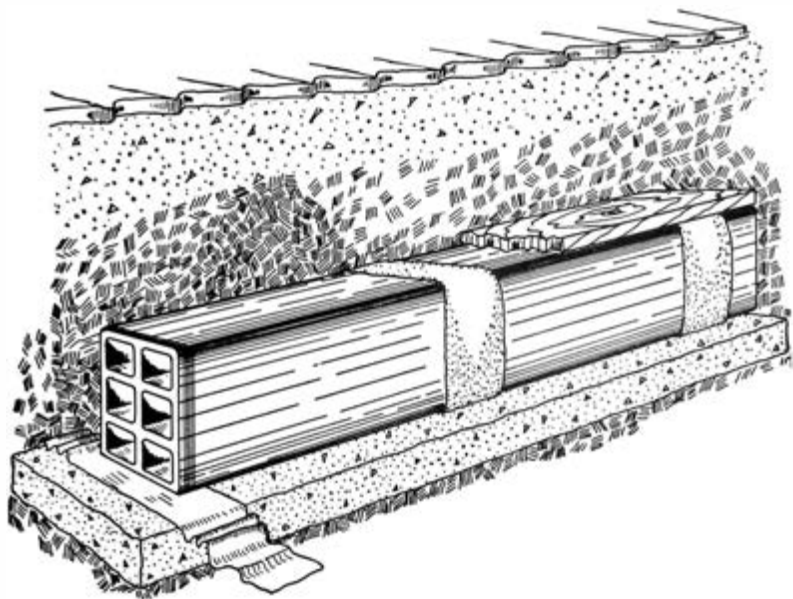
Multiple-duct vitrified clay conduit. (Rhodes 1929, Fig. 20)
